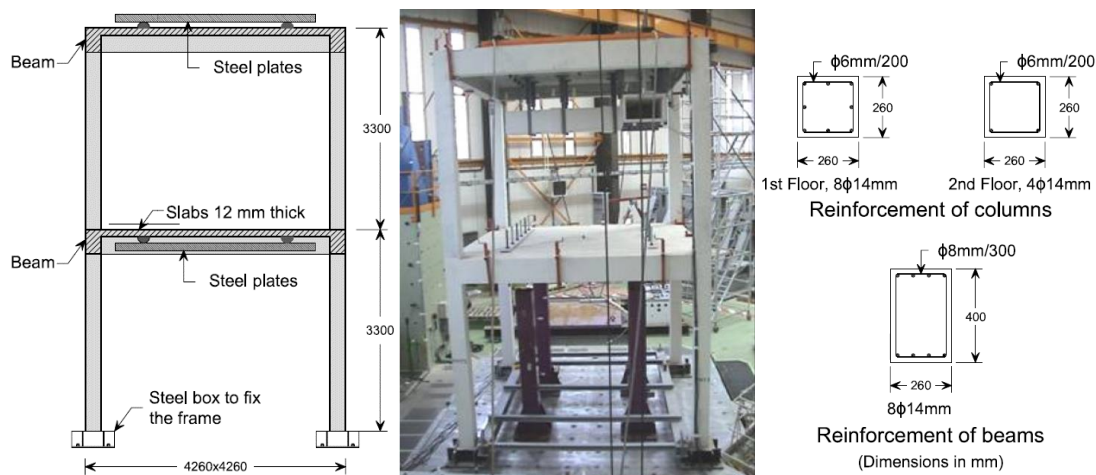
Sketch drawing of the building along with section sizes and reinforcement arrangements (Garcia et al., 2010)
